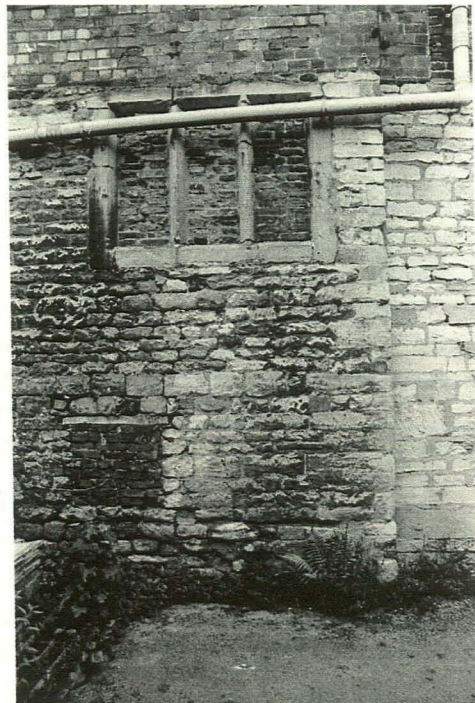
Blocked Mullioned Window in South Elevation of South Wing, looking north
